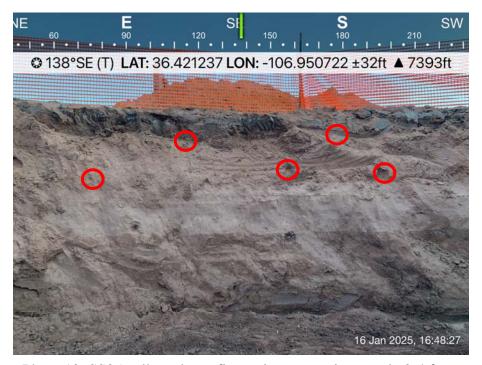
SS05 collected as a five-point composite sample 0-4 ft bgs from southeast sidewall of excavation.
